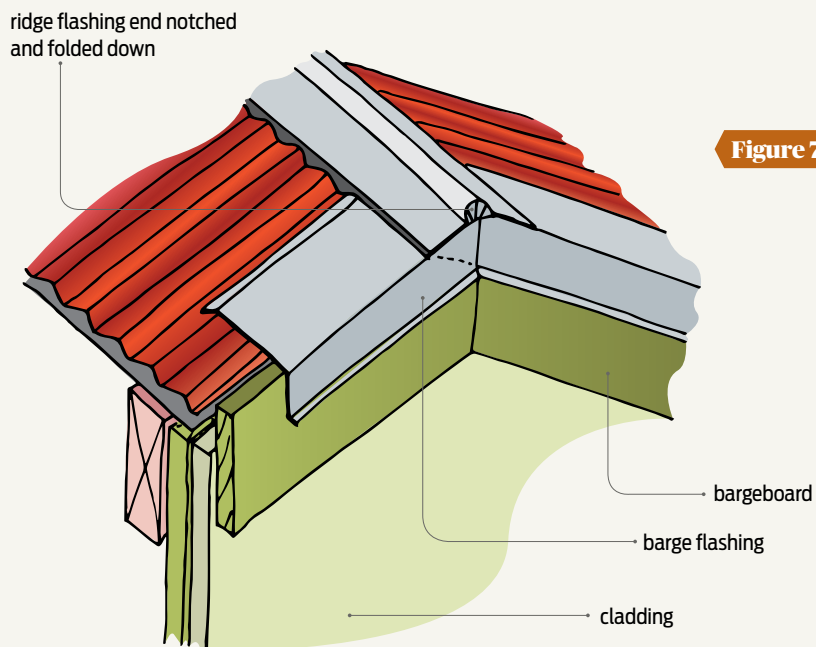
Intersection of the barge flashing and the ridge flashing to the gable end of a roof – Step 1.
